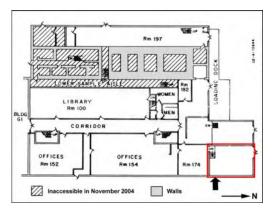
G2 337-Foot Level, Inert Gas Room
